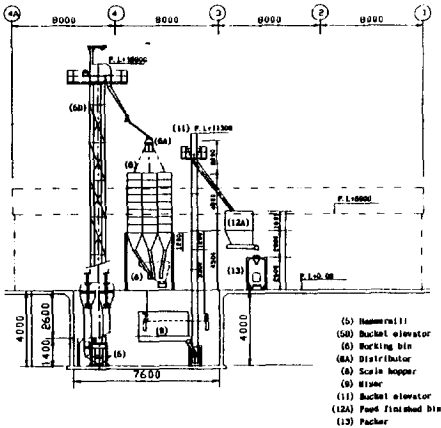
Details of mixing, grinding and bagging system(section A-A).
